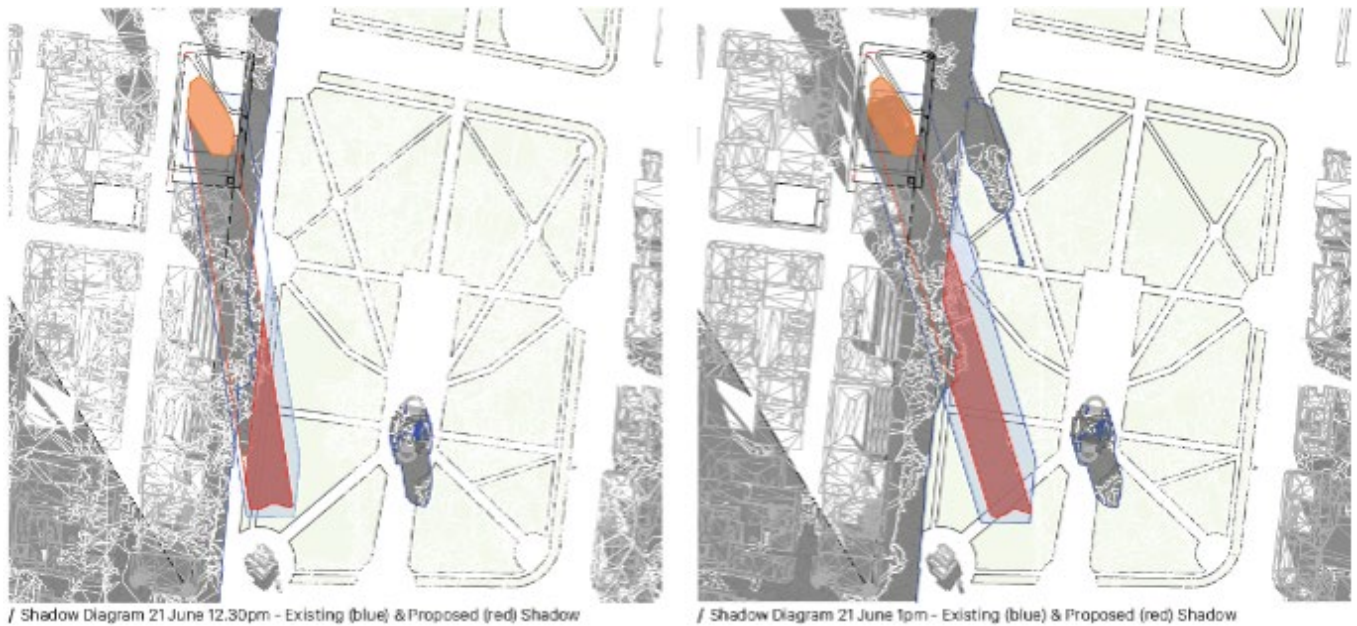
| Shadow diagram 21 June 12.30pm (left) and 1pm (right) (existing in blue and proposed in red) (Source: Ethos Urban Modification Report – Building Envelope Design Report)
